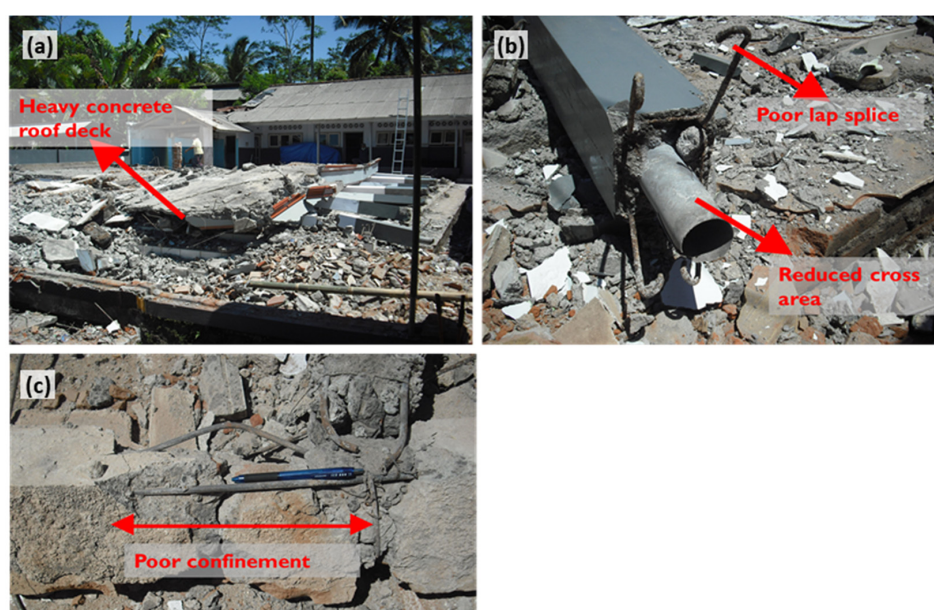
(a) Collapse of a single-story CM building with (b) poor column design and lap splice, and (c) low confinement.
